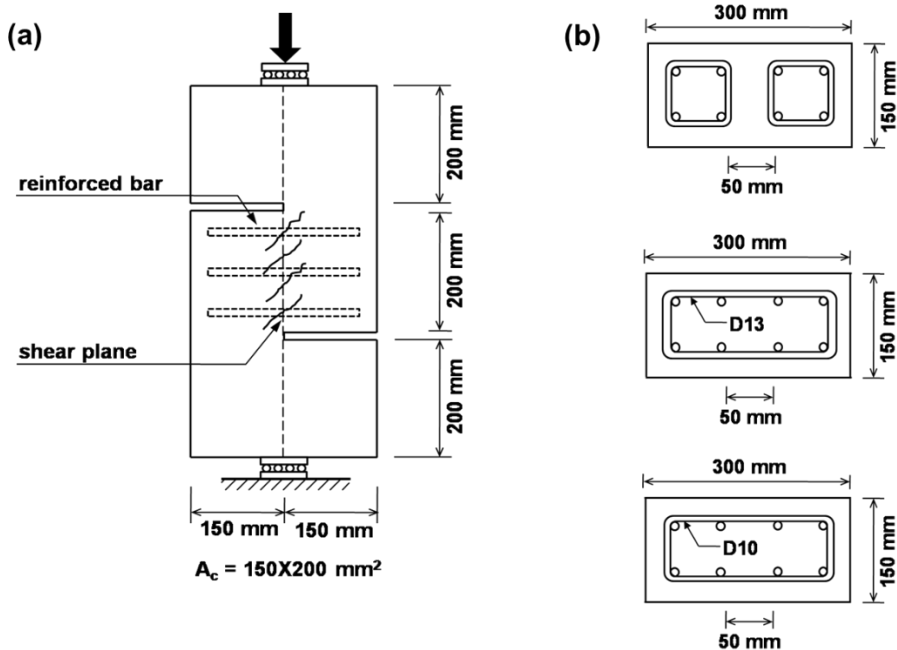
Specimen geometries for tests; (a) test specimen with reinforced bars, (b) specimen dimension and arrangement of bar
